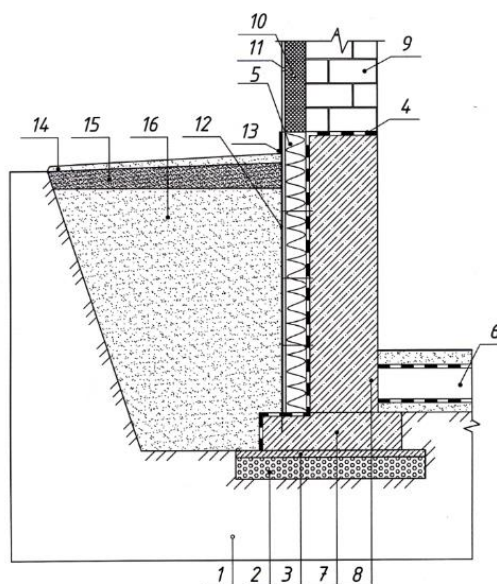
Thermal insulation of heated basement walls: 1-basis ground; 2 rubble pavement; 3 concrete pavement; 4 waterproofing; 5-extruded polystyrene foam; 6-basement floor; 7 foundation base; 8 foundations; 9 walls; 10- wall thermal insulation layer; 11 wall plaster; 12 flat asbestos cement sheet barrier; 13- pallet; 14- blind area; 15 sandy bedding; 16 refilled.
